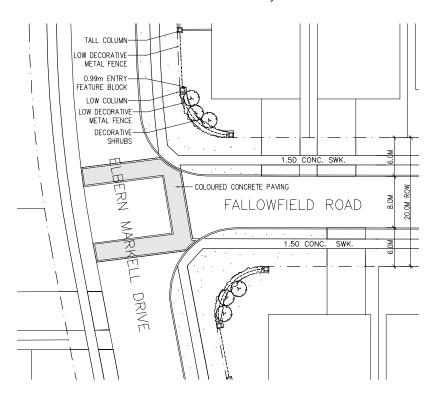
Concept Plan of Executive Gateway Feature B
